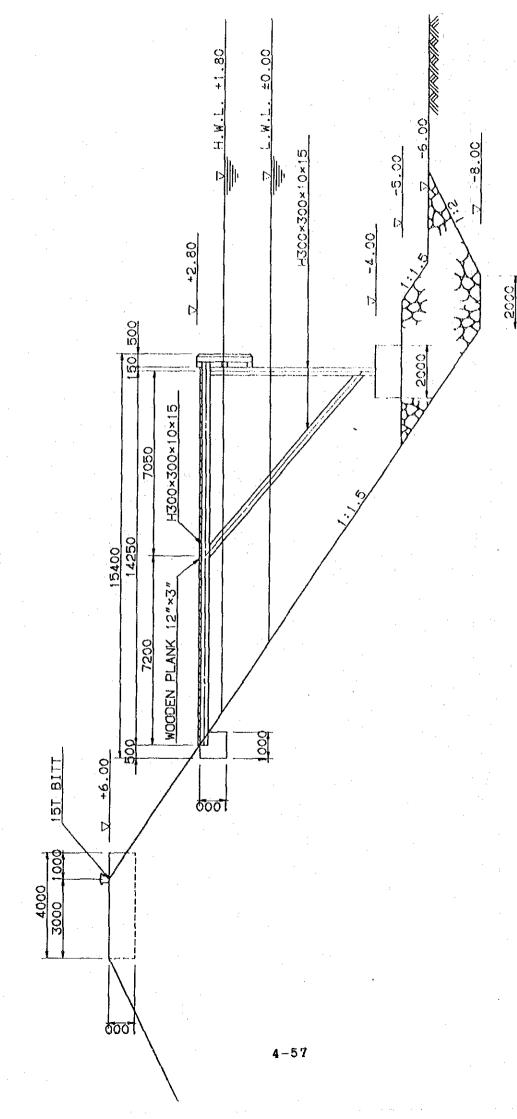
(2) Mooring Facility in Outer Fishing Harbour Typical Section
